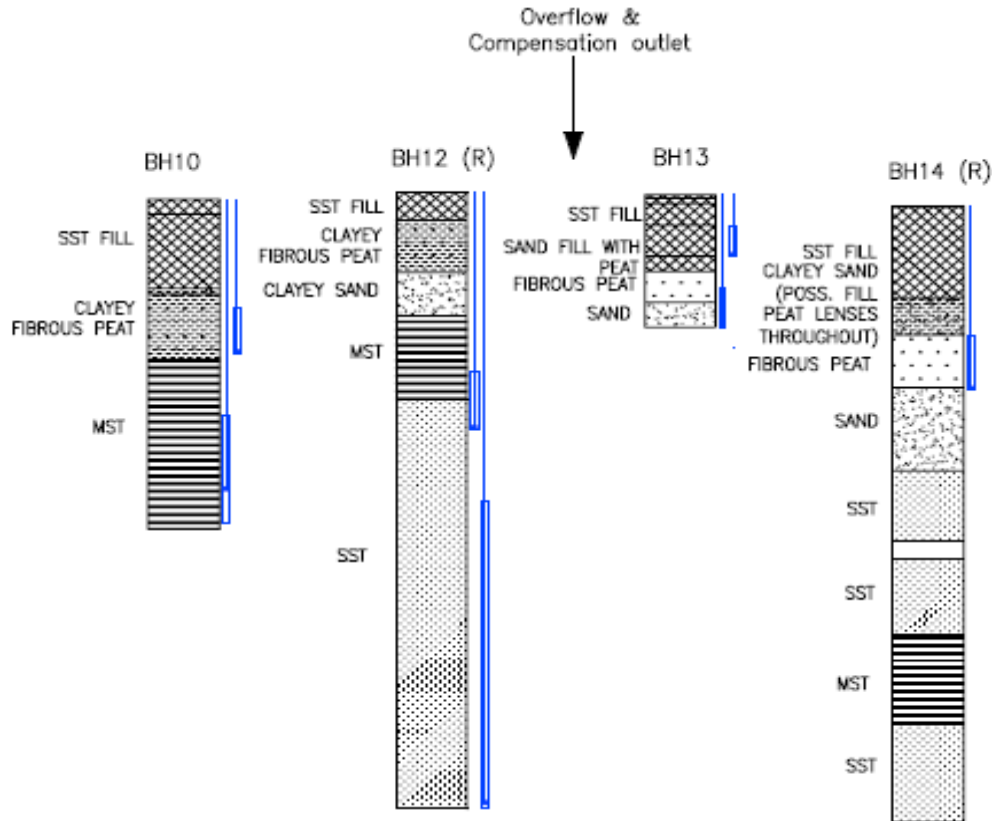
Historical boreholes surrounding Whiteholme outlet tunnel
